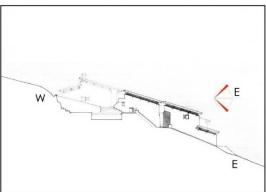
Building on a North-Facing Slope (Author) Figure 24 Building on an East-Facing Slope (Author)
